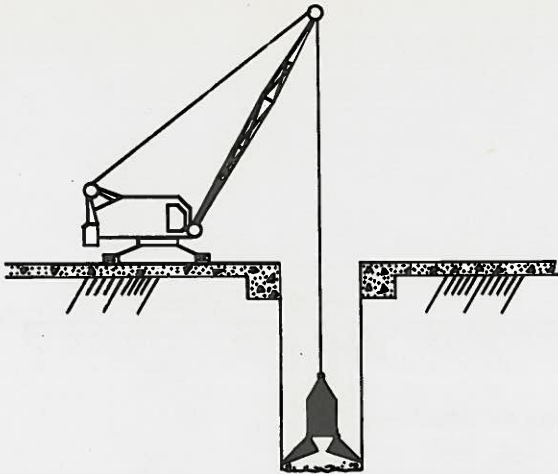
50-INCH DIAMETER UNCASSED EXCAVATION TO 75 FEET.
